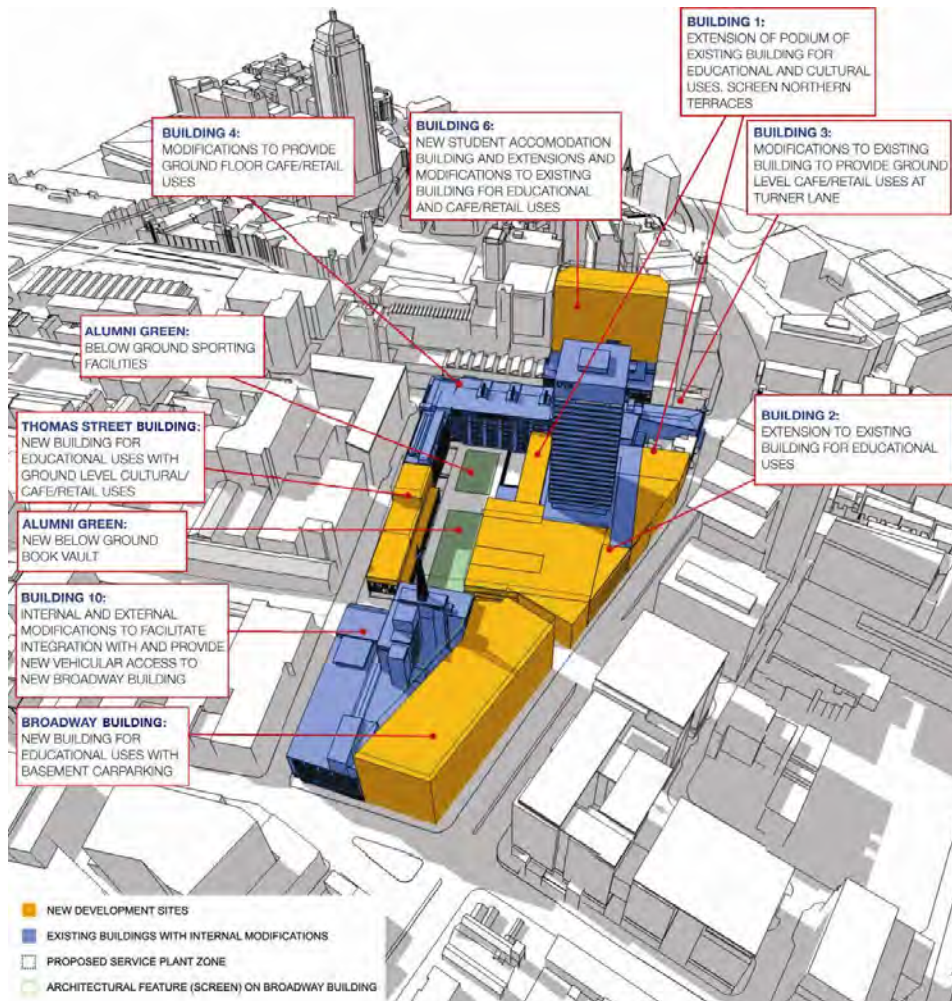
3D Model of approved concept plan (Source: BVN, DCM and JBA)
